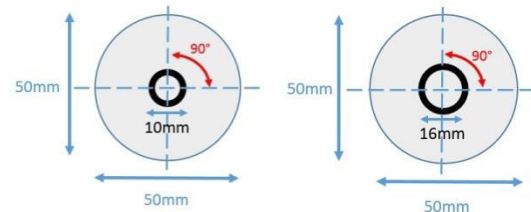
Detailed column(s) arrangement for 4.00 % and 10.24 % of area replacement ratio.
